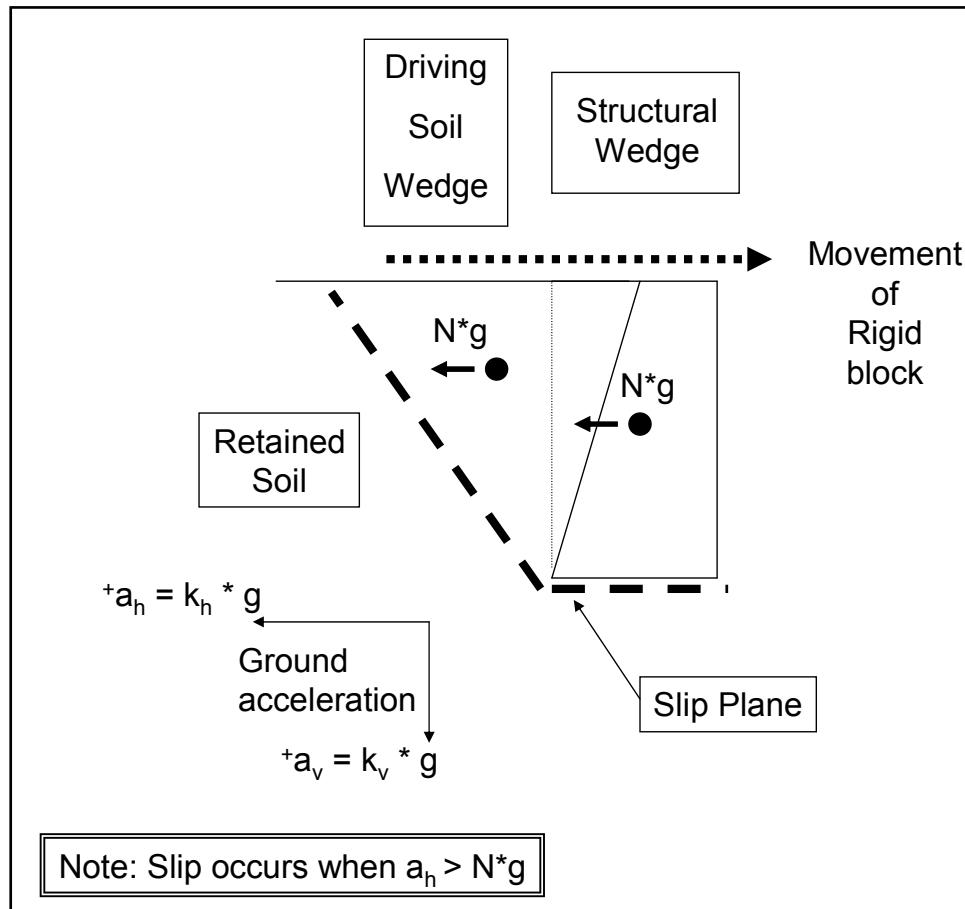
Gravity retaining wall and failure wedge treated as a sliding block (after Whitman 1990).
